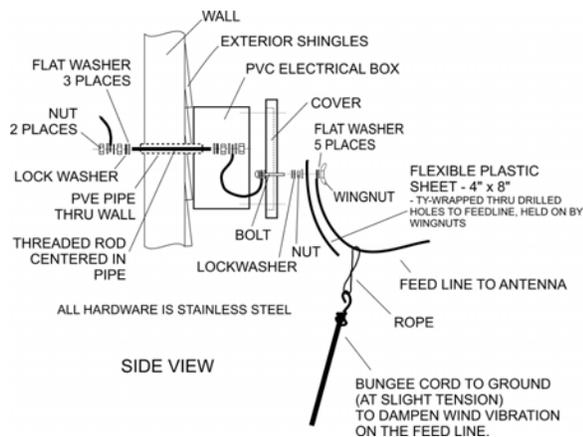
Drawing showing detail of feeding balanced line through a building wall.
